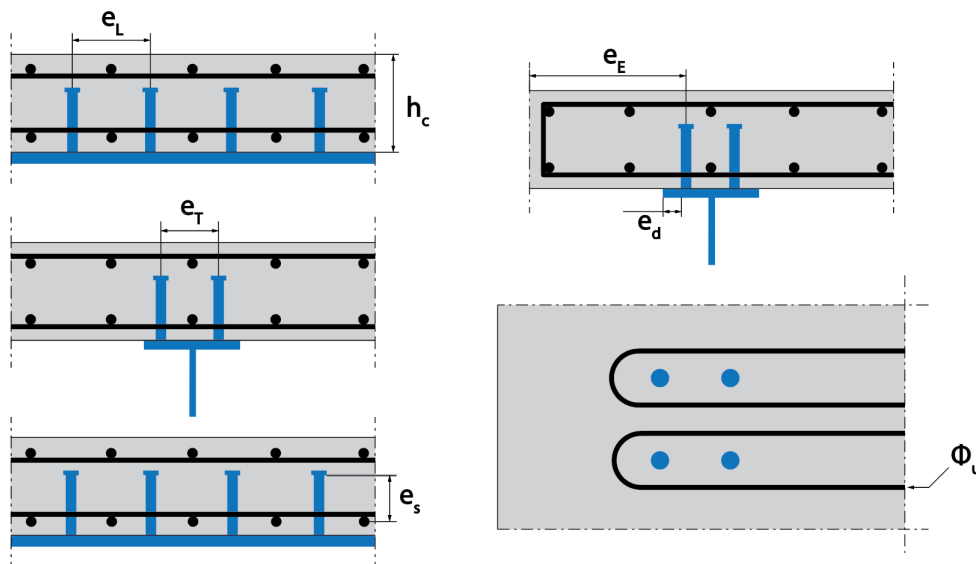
Spacing and detailing of headed stud shear connection, redrawn from (Vayas & Iliopoulos, 2013)
